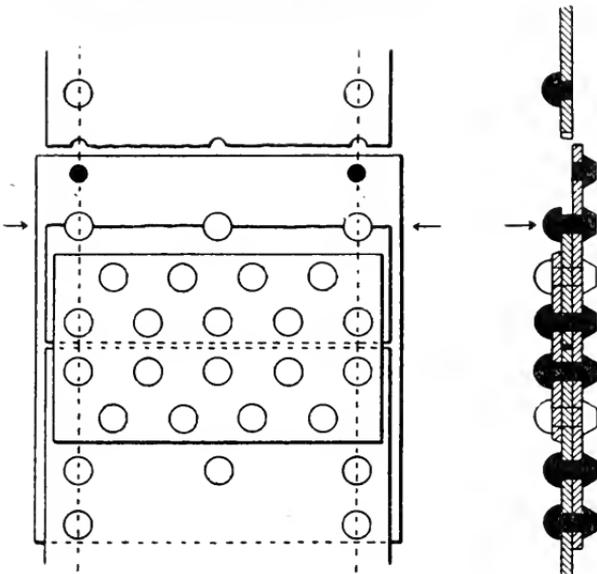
FRACTURE THROUGH THE NEXT-TO-OUTSIDE ROW OF RIVETS.
